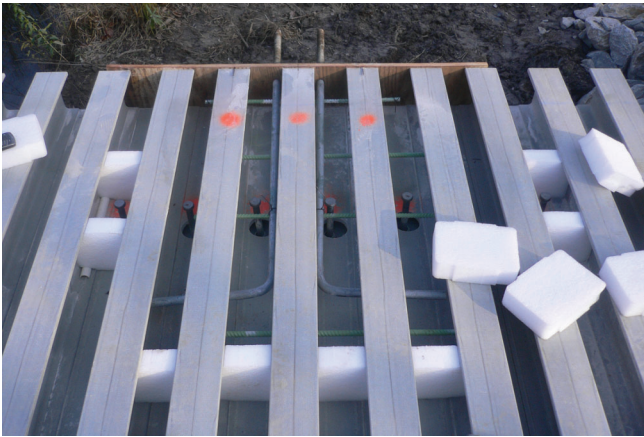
Reinforcement and Shear Studs at Guardrail Location
